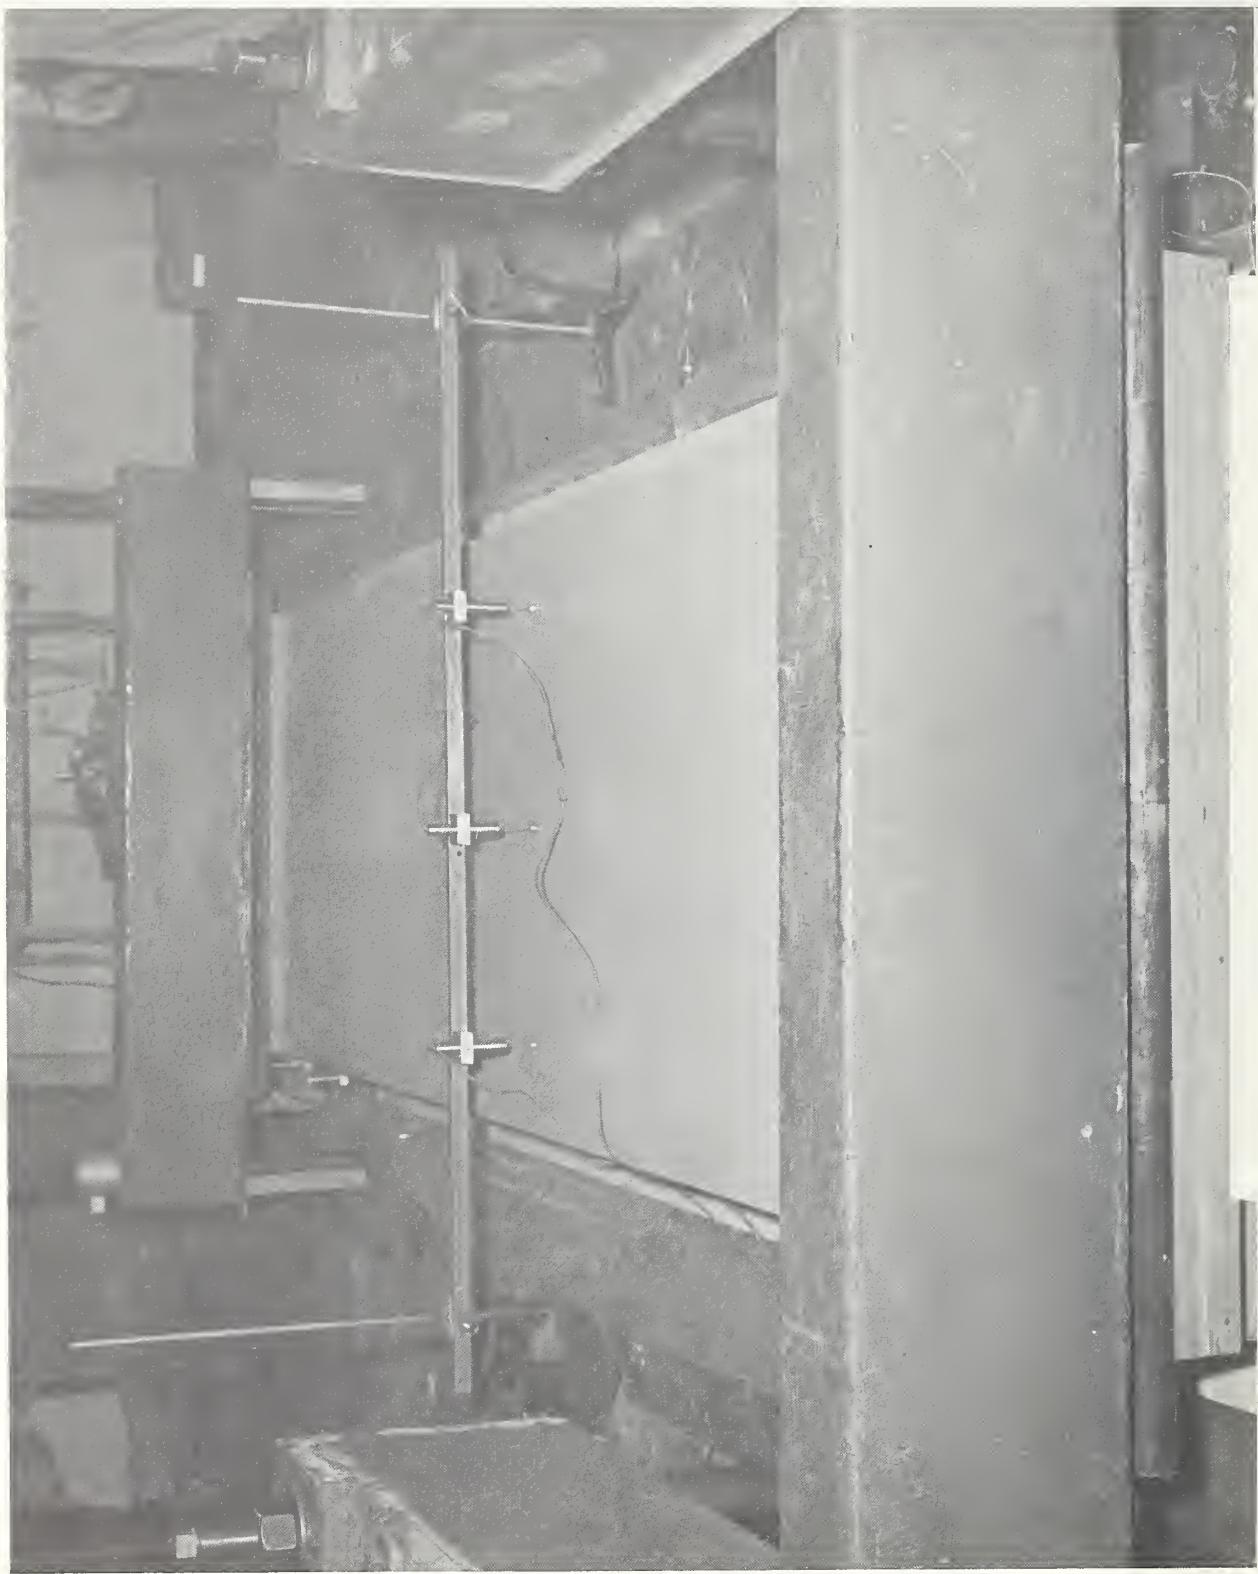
Photograph of short-term flexural test on roof panel.
